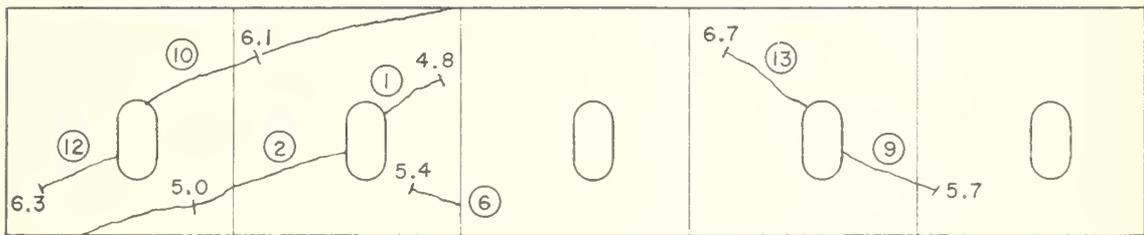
CRACK PATTERN IN BEAM NO. 1
